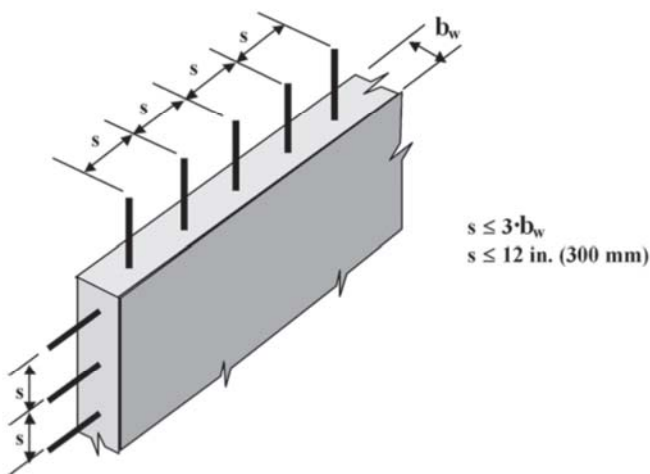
Reinforcement spacing in reinforced concrete walls.
